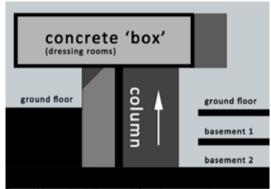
sectional diagram reinforced concrete column supporting dressing room area.
